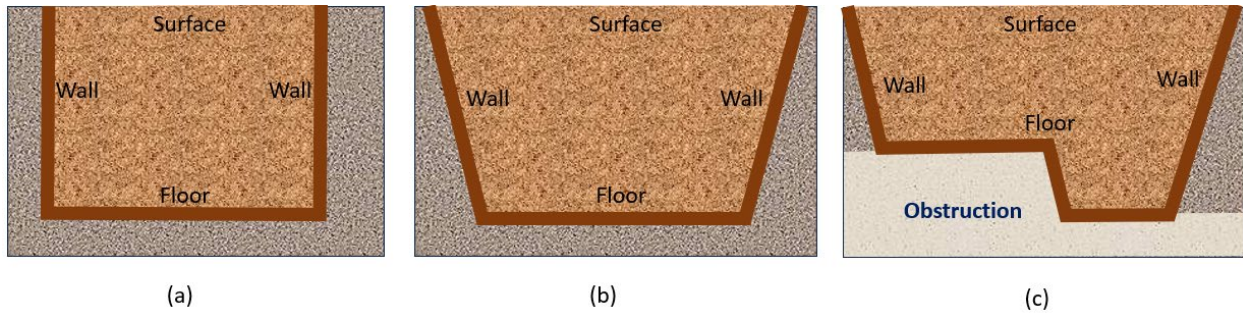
Cross sections of some example SSU configurations. (a) A shear wall and flat floor configuration, (b) wall lay back requirements for safety consideration, (c) wall and floor irregularity are possible with complex substructures.
